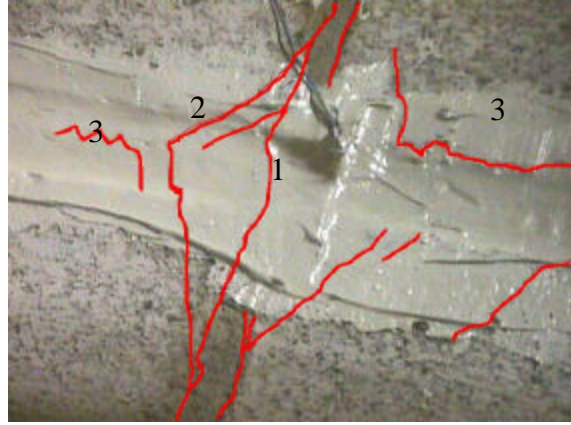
Mid-span joint with flexural cracks (1), crack due to principle tensile stress in the paste and in concrete (2), splitting cracks due to tensile failure of the paste or of the concrete-paste interface (3).
